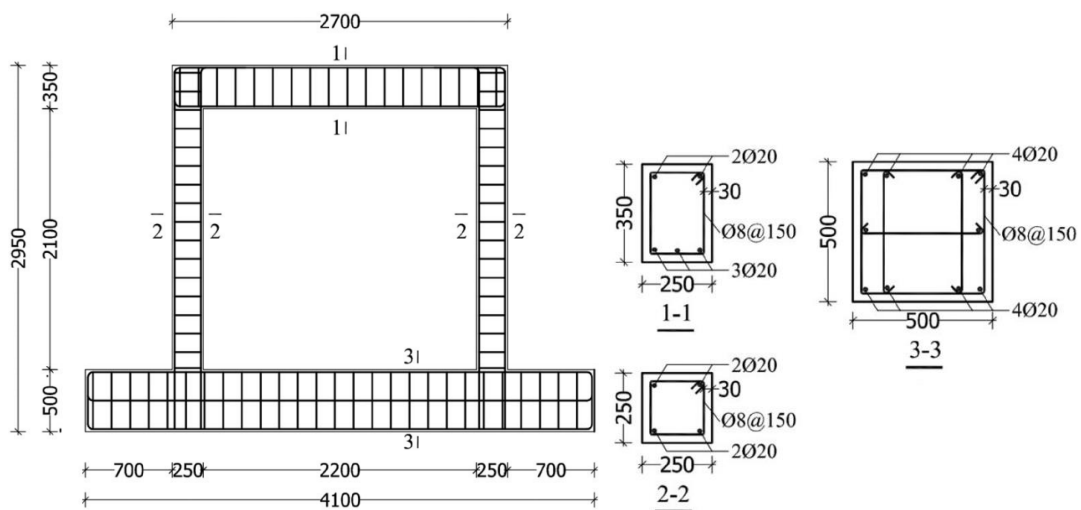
Reinforcement details of the RC frame for specimen FIF (measured in mm) [31].
